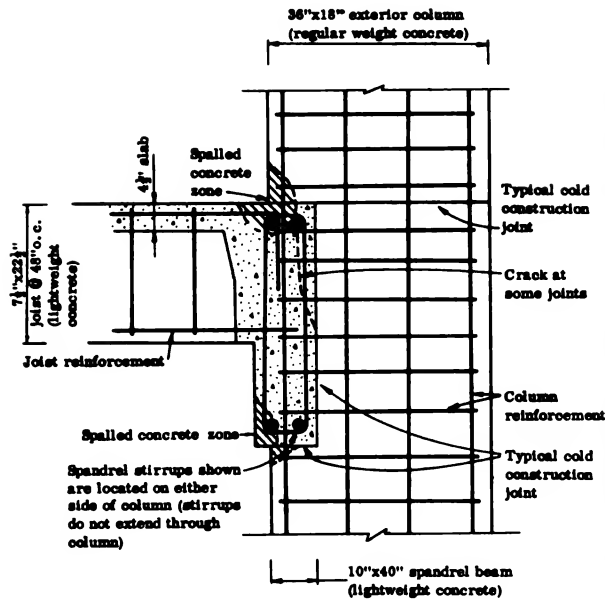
Bank of California. Typical construction of exterior column-spandrel-joint connection from fourth floor to roof.
